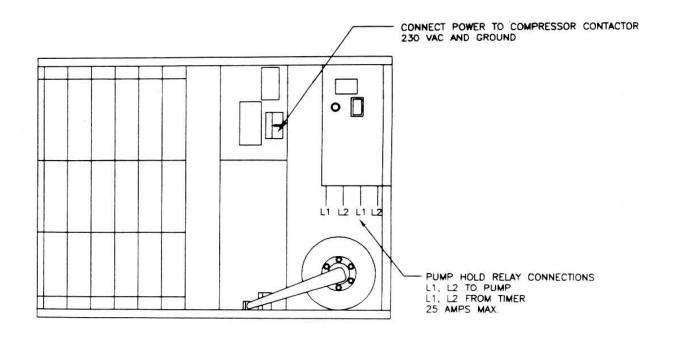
ELECTRICAL CONNECTIONS HEAT PUMP WITH FRONT PANEL REMOVED
